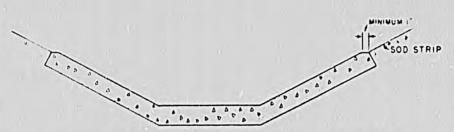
Section of concrete-lined channel showing treatment of edges.
